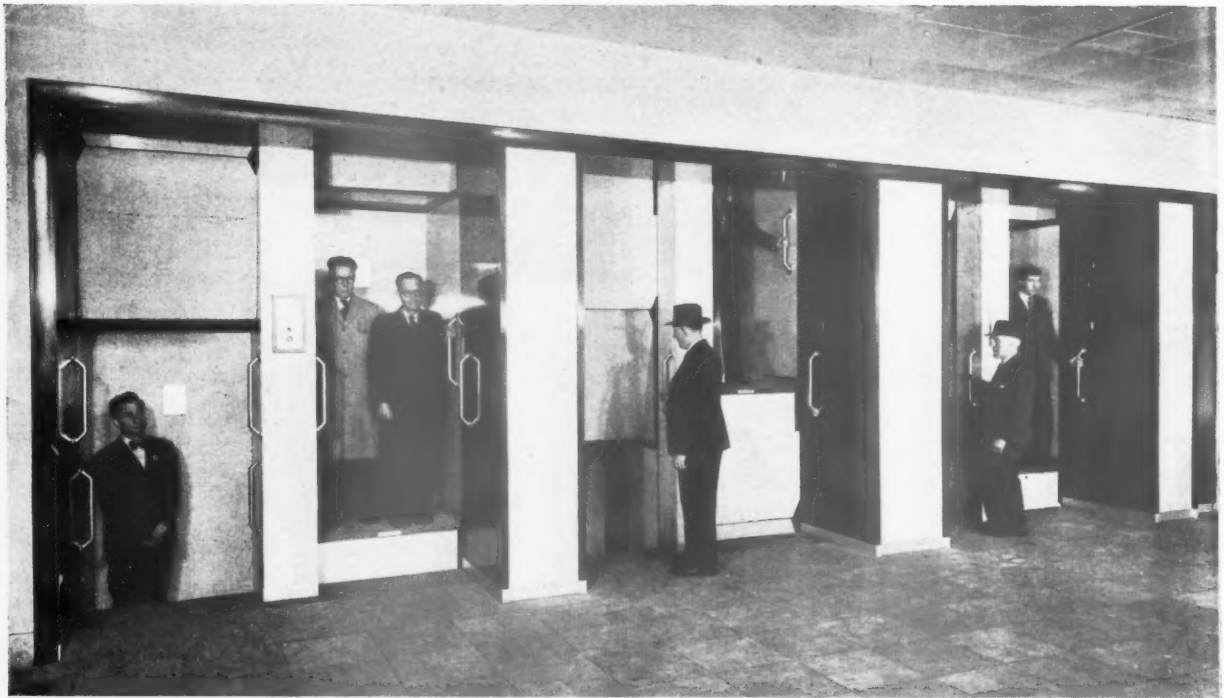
A Paternoster lift installed in an office building in Newcastle.
